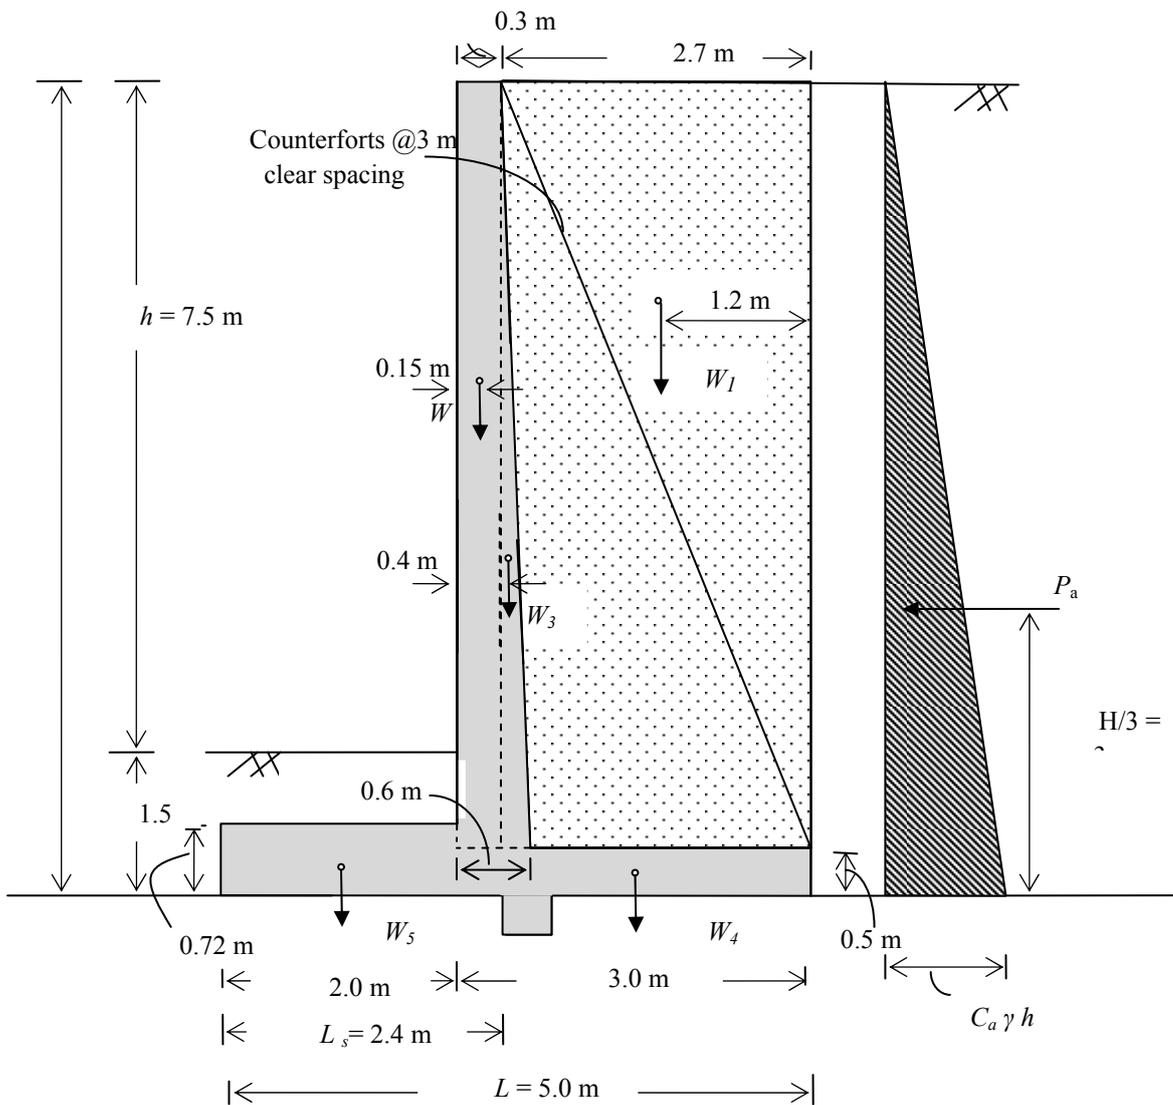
Typical Cross Section of the Counterfort Retaining Wall (Pillai and Menon, 2009)
